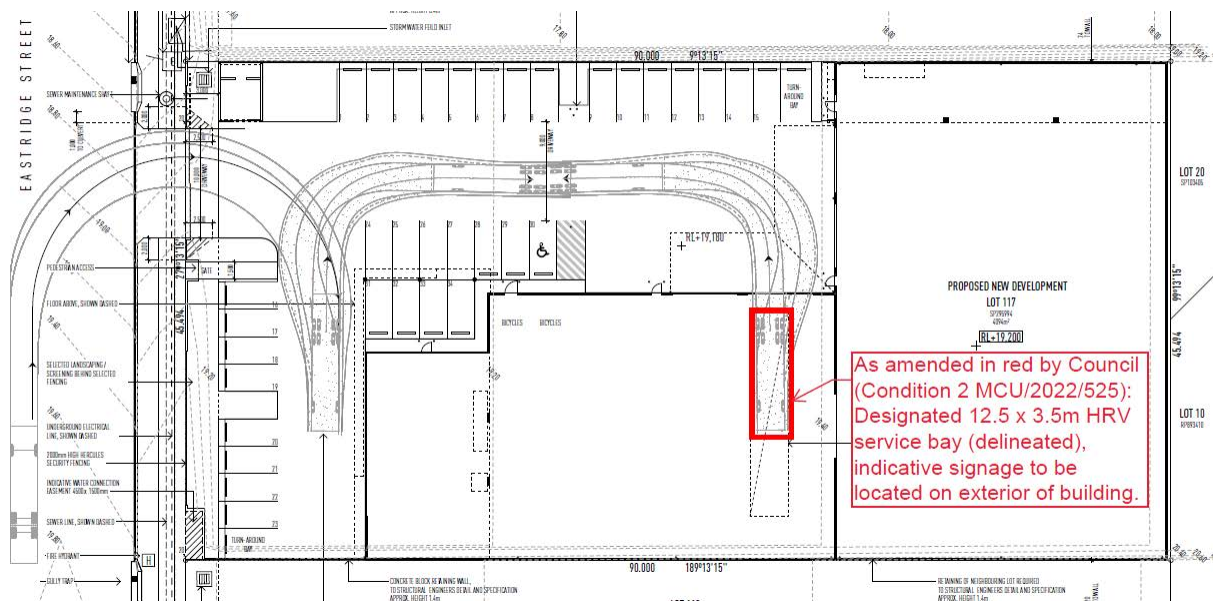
Approved site layout MCU/2022/525 (GDP File, 2024)
